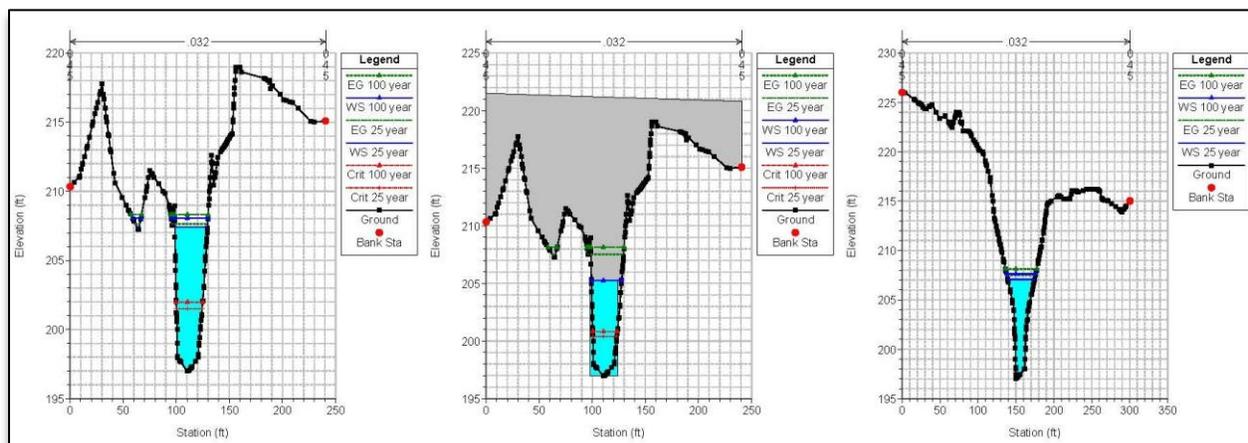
HEC-RAS Upstream, Bridge, and Downstream Cross Sections
